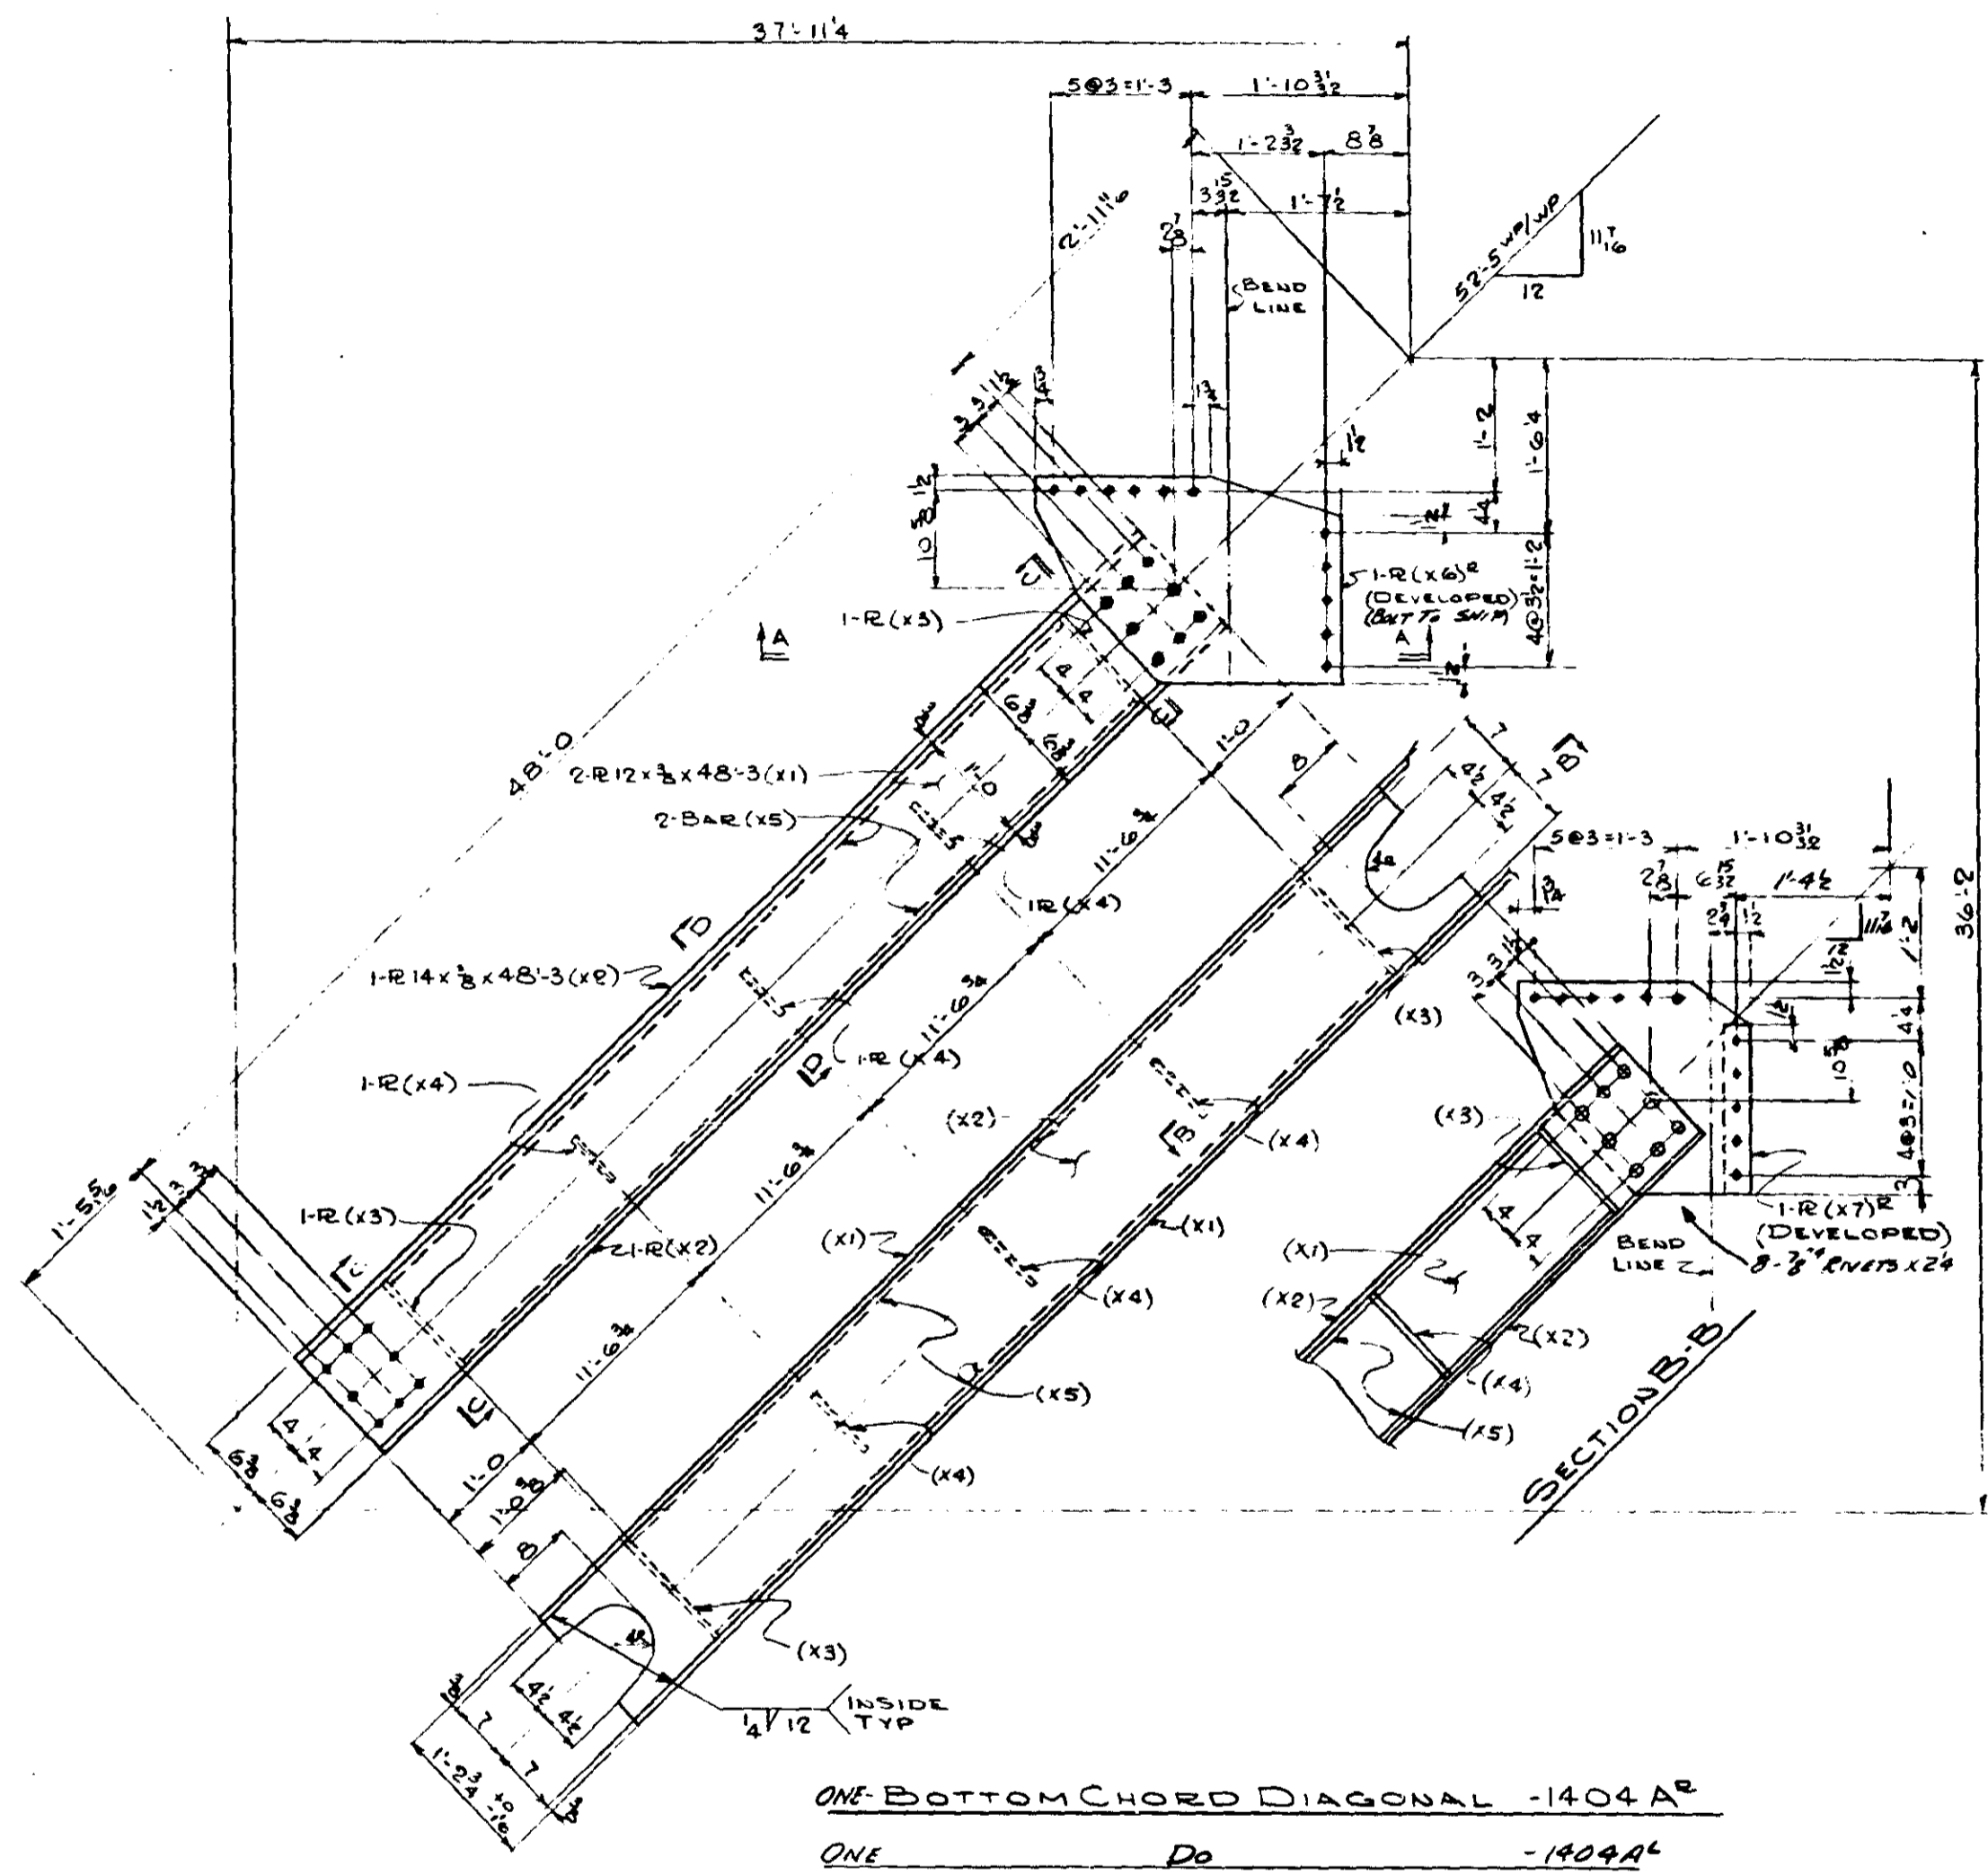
DETAILS OF TRUSS DIAGONAL (L27-U26)E+W
